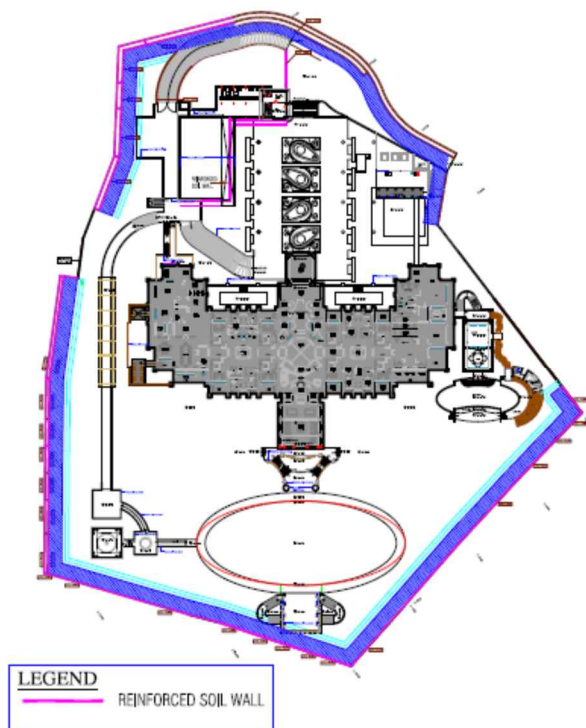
Plan showing location of Reinforced soil wall for slope protection.
